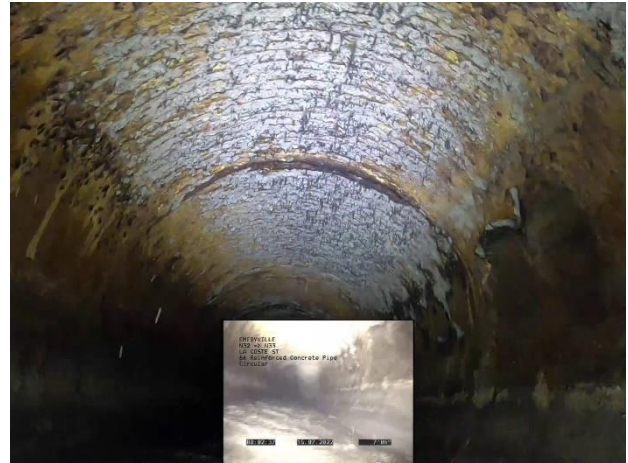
VANDA Level 5 condition with exposed reinforcing steel; 8 to 20 feet downstream from N32
